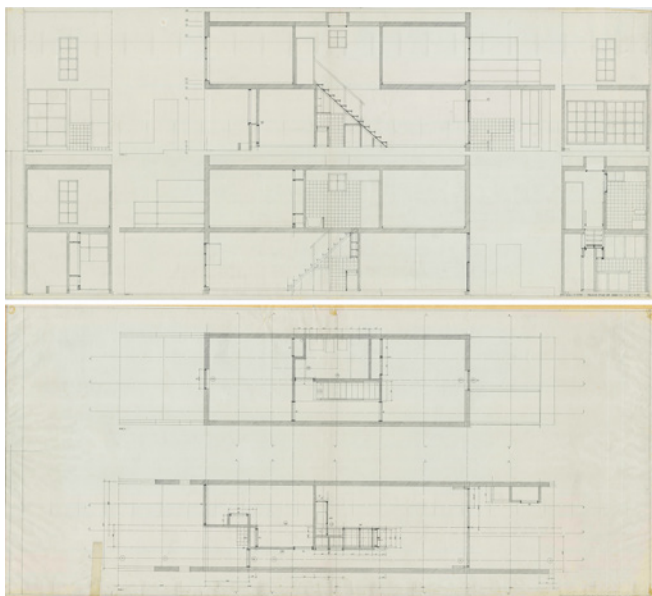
S. Vítor neighborhood, plans, and sections (Arq<sup>o</sup> Álvaro Siza. Col. Fundação de Serralves – Museu de Arte Contemporânea, Porto. Donation 2021).
